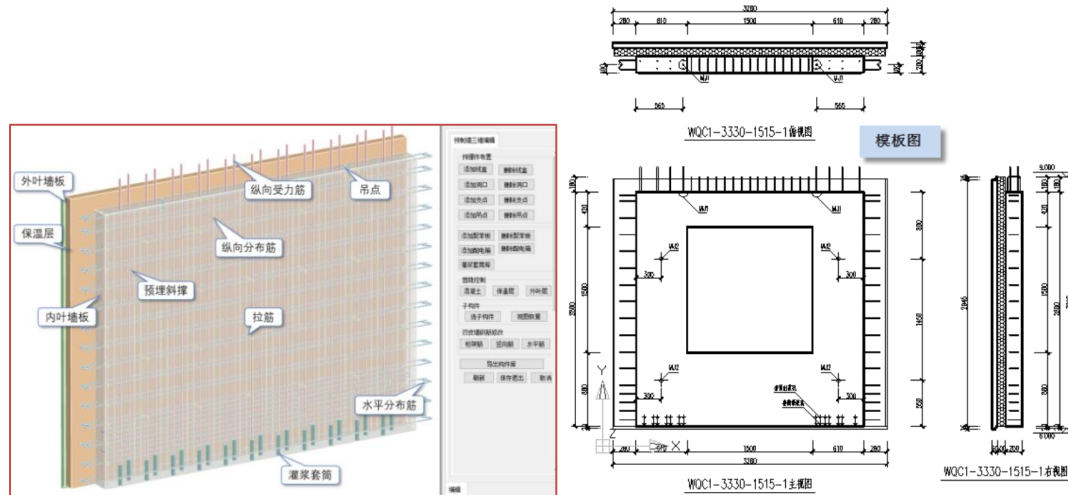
a sandwich prefabricated exterior wall (with an insulation layer which is larger than wall itself)
